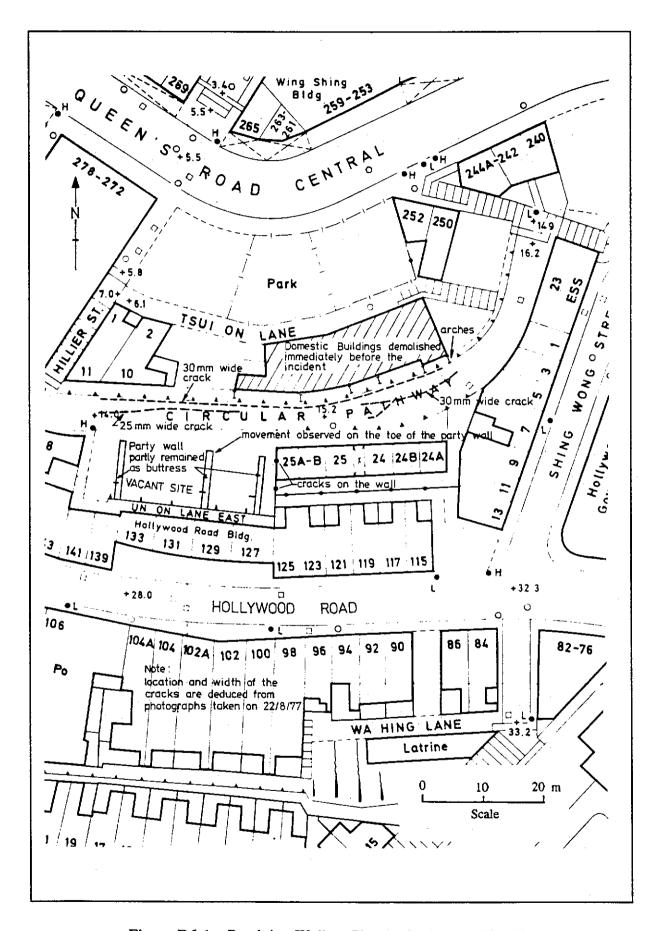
Retaining Wall at Circular Pathway - Site Plan
